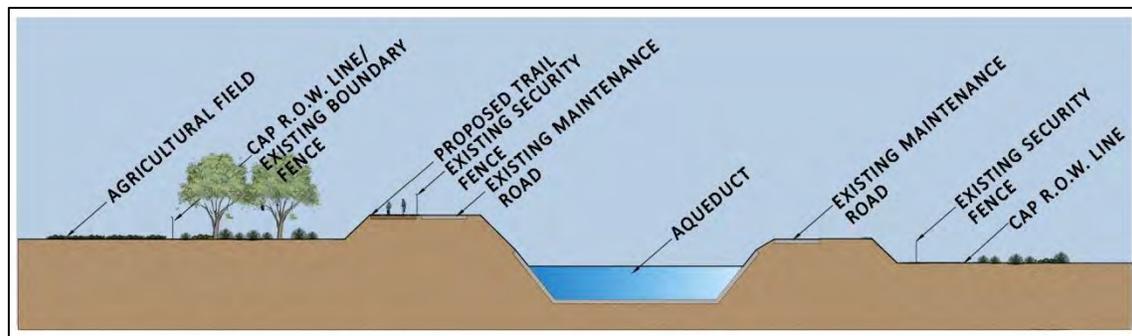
G: Cross-Section PN-3 - Typical of Mile Post 4.4 to Mile Post 4.65
